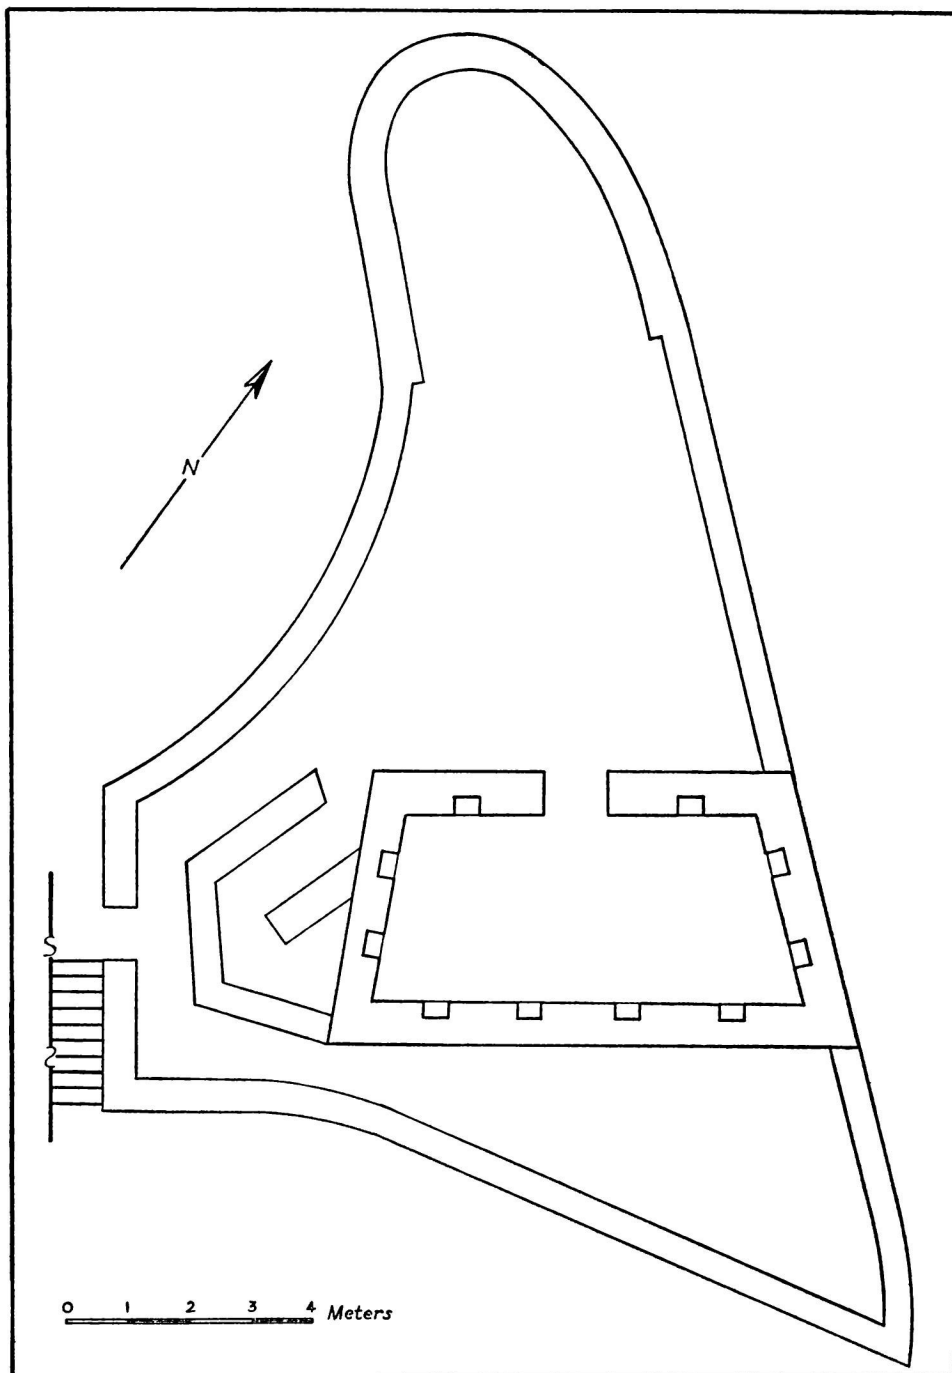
PLAN OF HOUSE GROUP 1 AT PHUYU PATA MARKA
